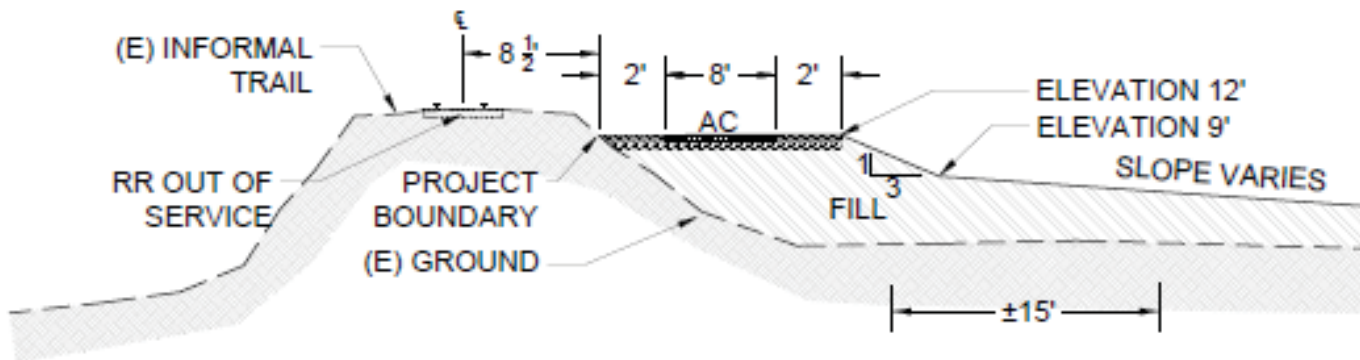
Conceptual Waterfront Trail extension cross section showing trail width, slope ration, and fill elevation relative to the existing railroad grade (Appendix A, Sheet C-11).
